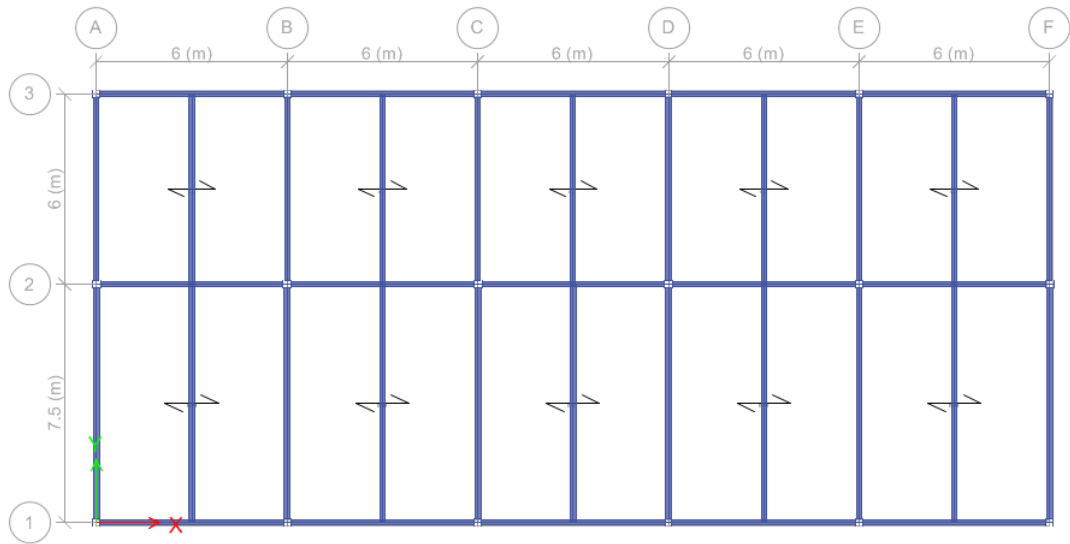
Typical floor plan of the dormitory building (IR4F-T).
